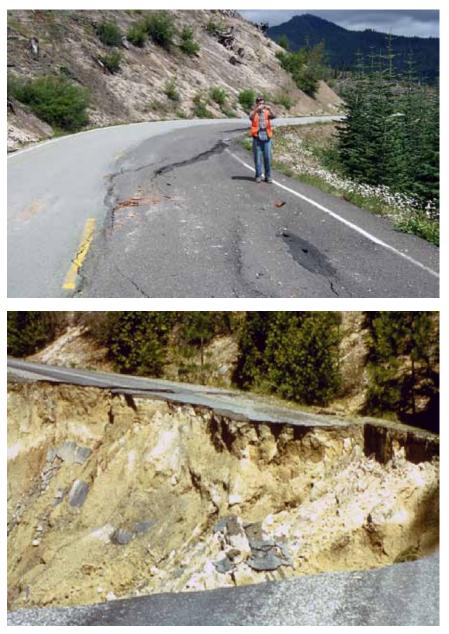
A fillslope settling or beginning to fail, and a failed roadway fill.
